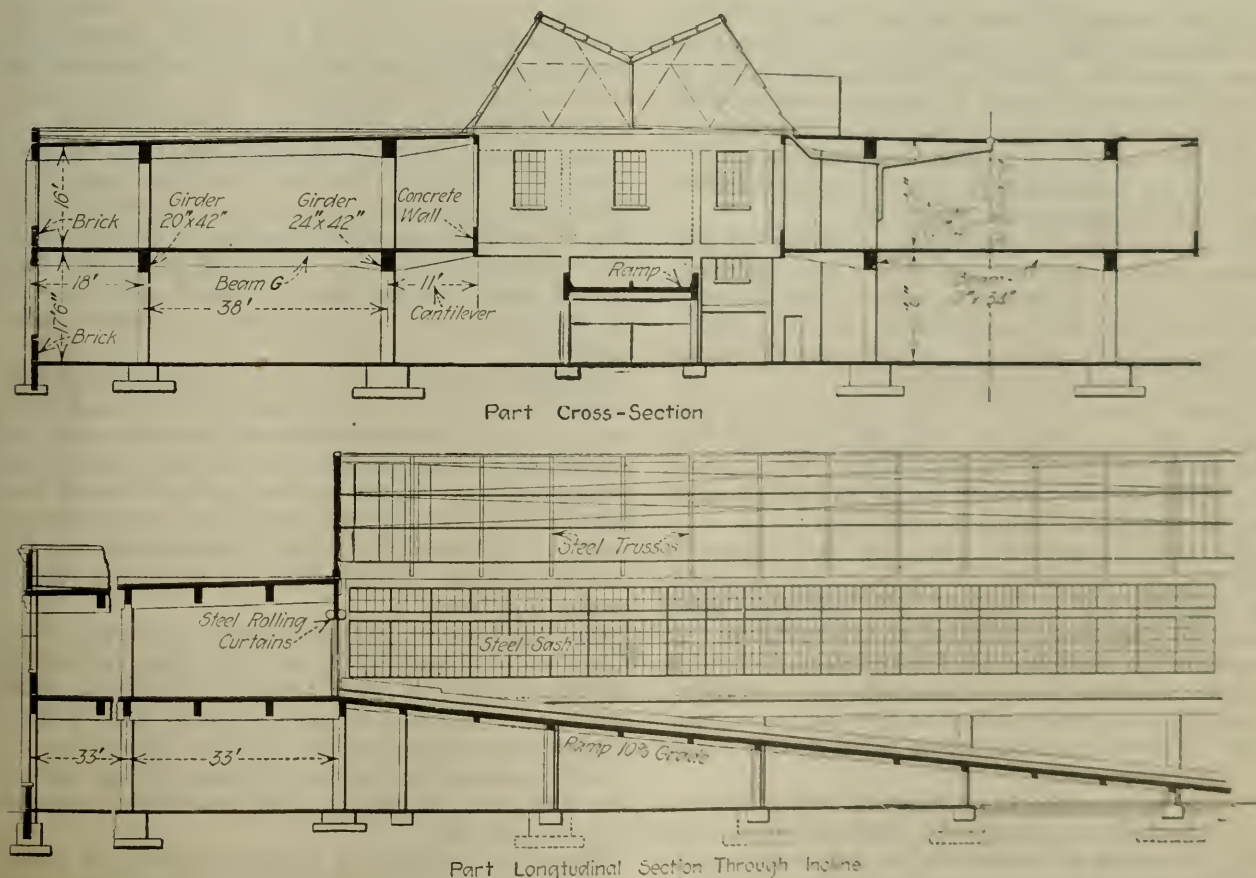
CANTILEVER FLOOR AND ROOF CONSTRUCTION FOR GARAGE
